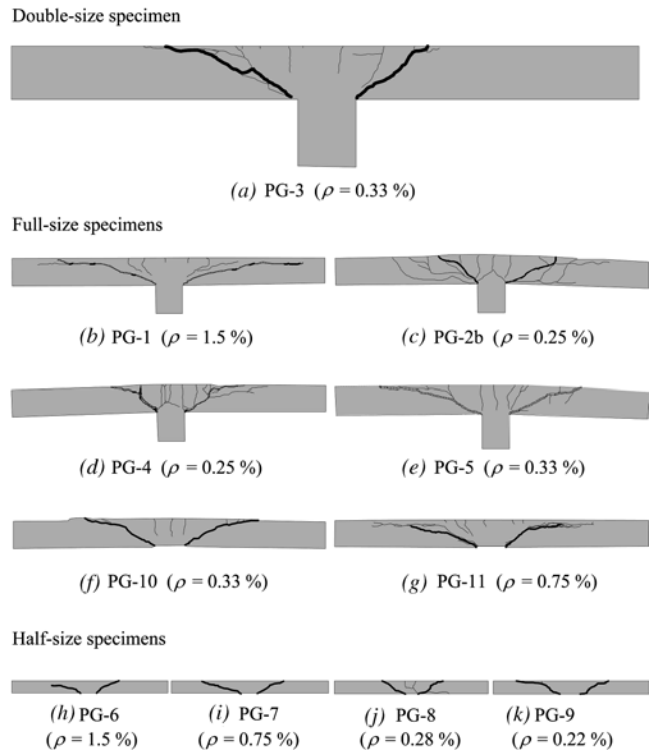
Cross section of specimens after failure with critical shear crack emphasized.
